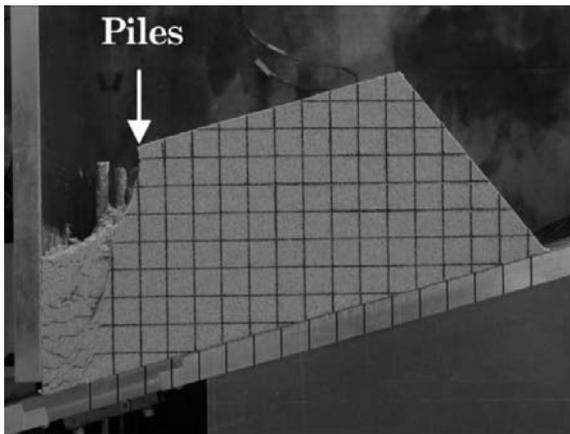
Slope Condition after the Centrifugal Loading Experiment: Slope failure occurred around the piles inserted into the slope
